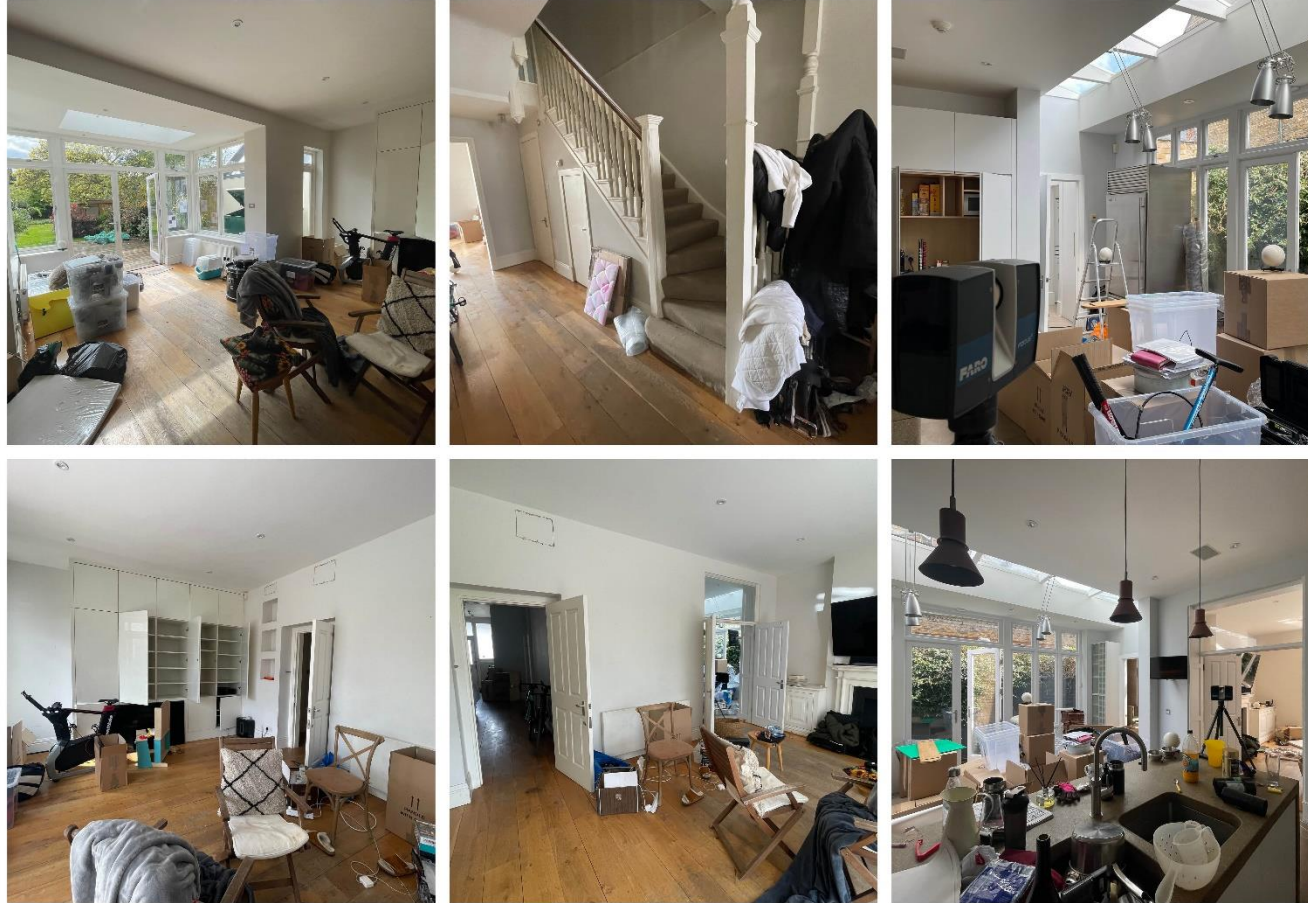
Ground Floor Photographs as Existing – Reading Top Left to Bottom Right; Living Room and Conservatory, Entrance Hall, Kitchen Side Lightwell, Rear Living, Rear Living viewing to Hallway, Kitchen
